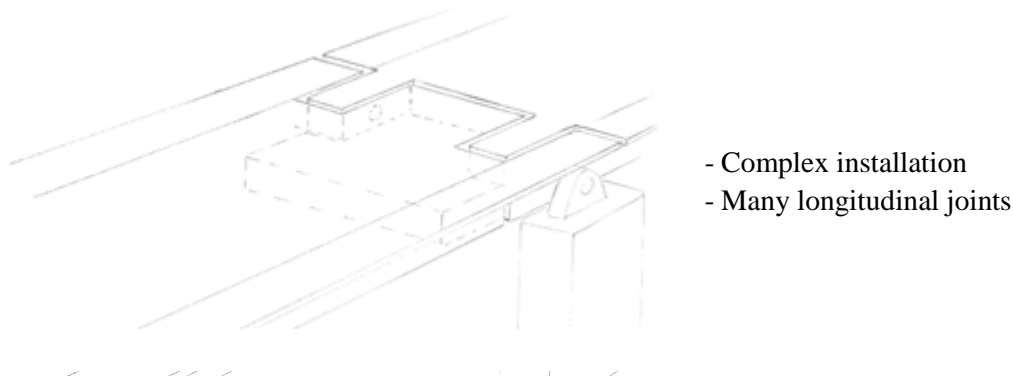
Back span stepped joint with kentledge below slab arrangement (KGAL, 2017)
